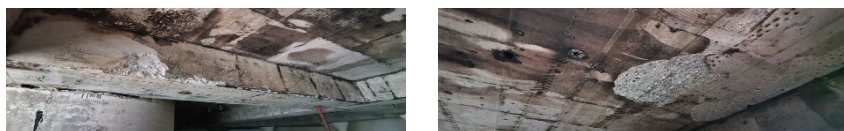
Concrete spalling of beams (left) and insole (right) at the fire zone
